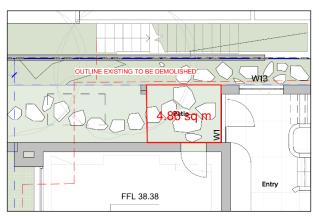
Ground Floor Plan marked up by Assessment Officer.
